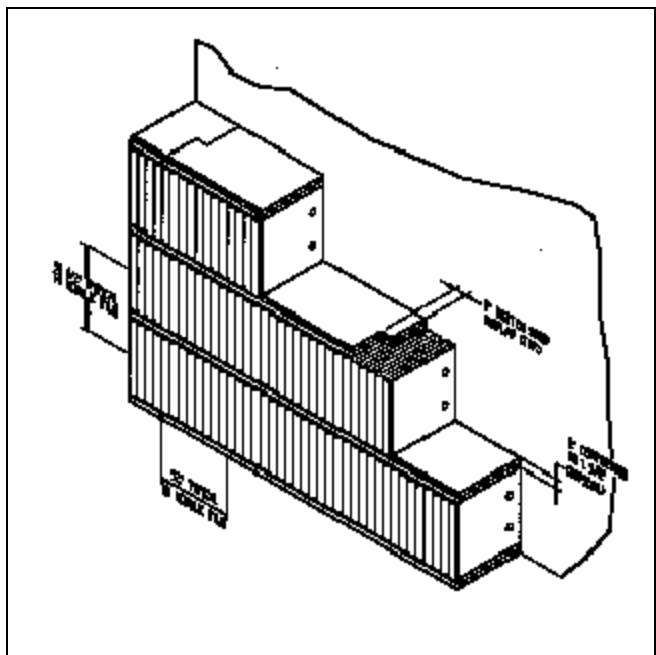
Typical Installation Using Soldier Course Pattern with Batten Strip
